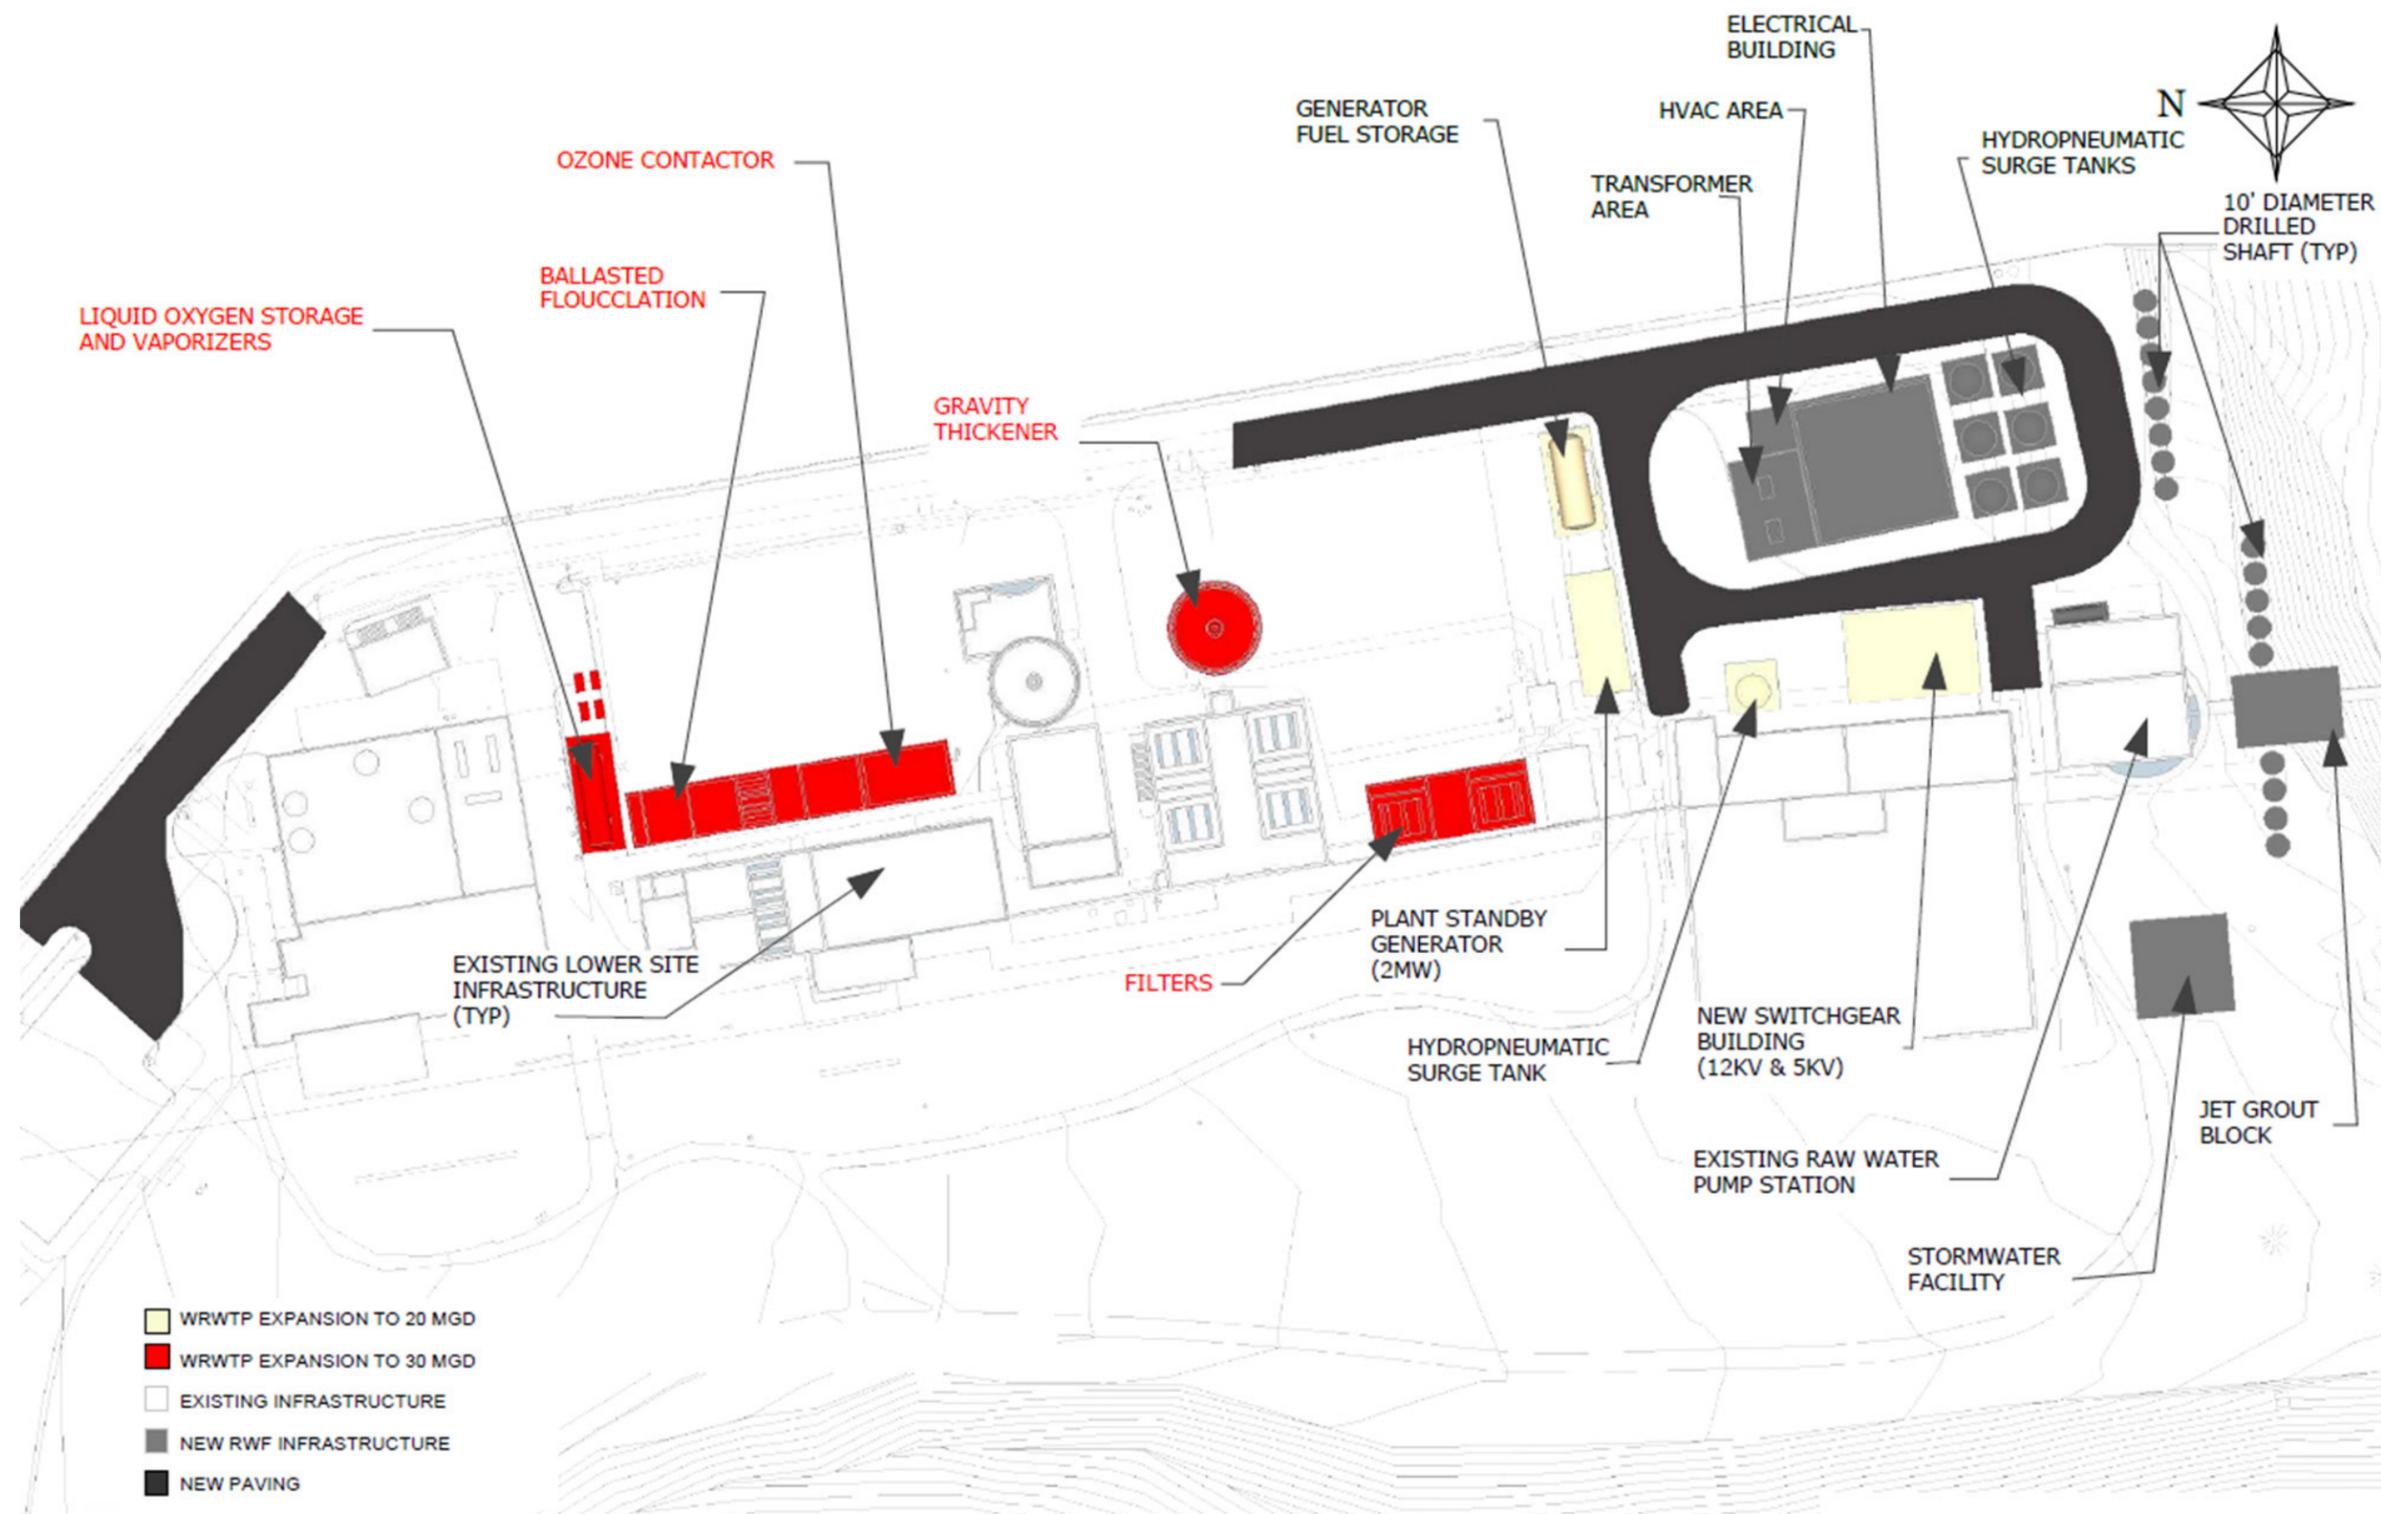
Site Plan – 30-MGD Capacity Expansion
